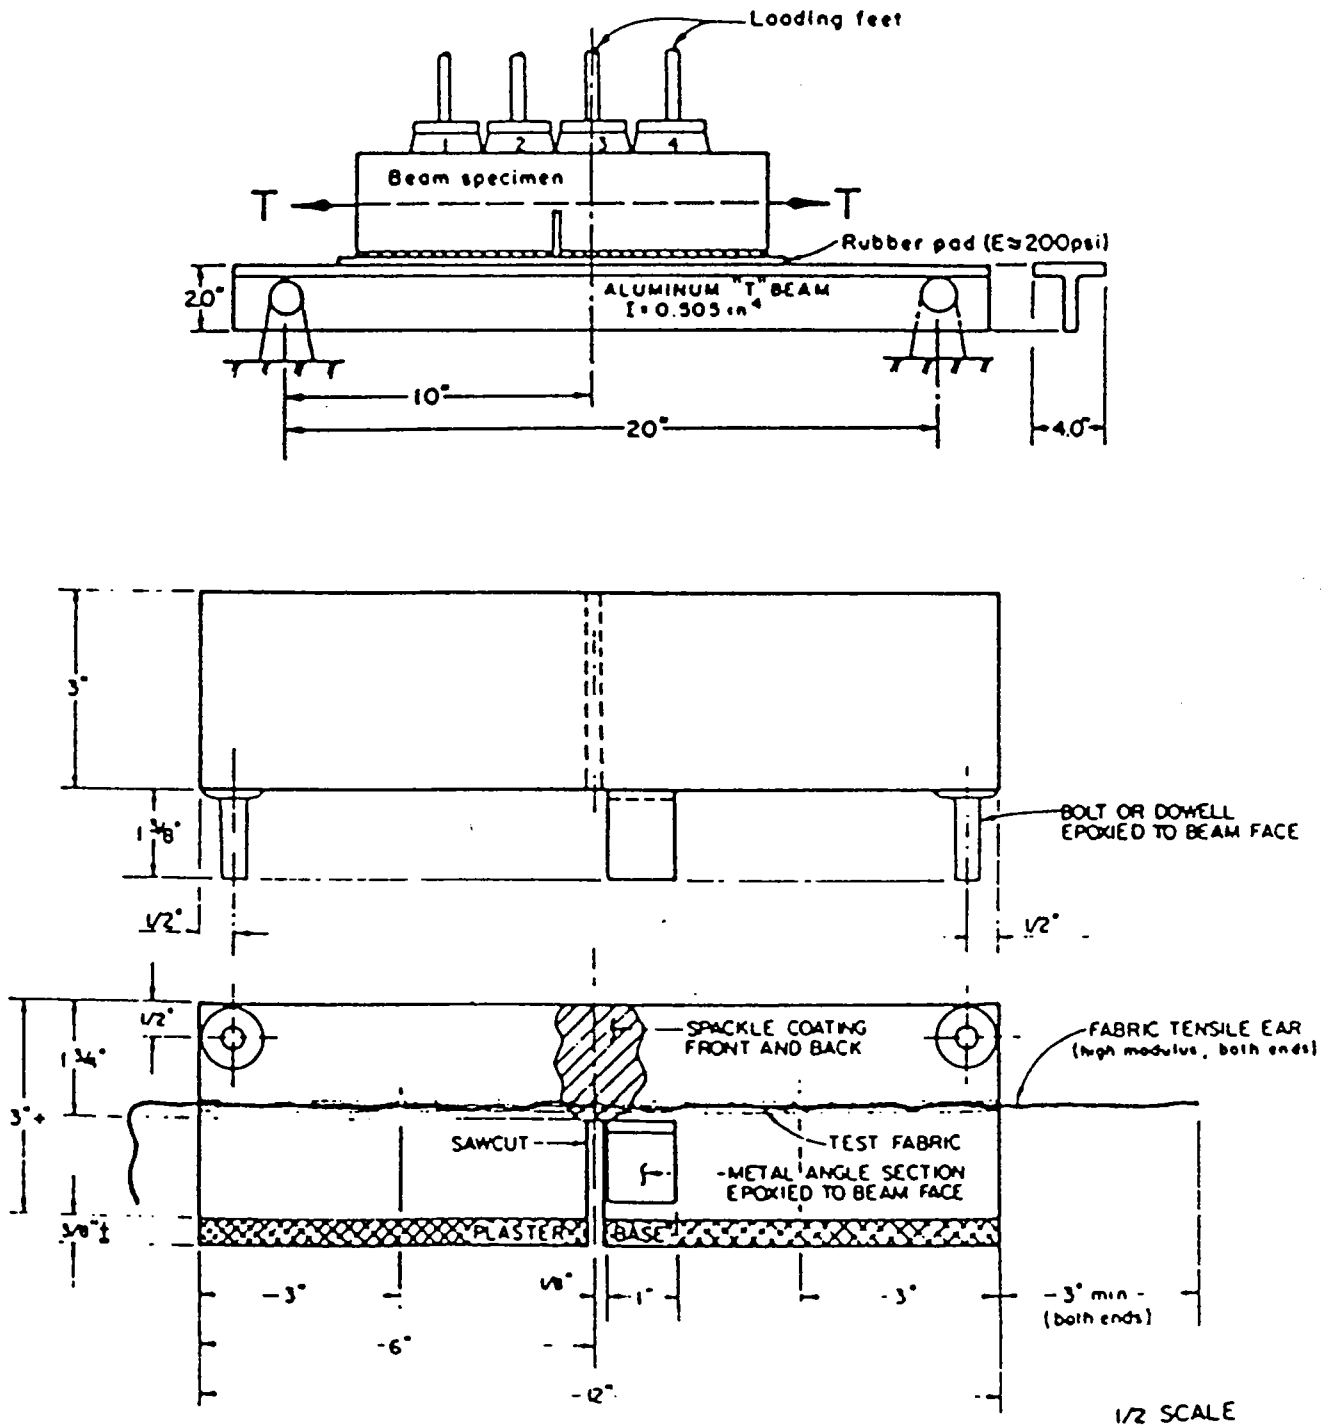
Testing Arrangement for Beam Specimens (after Smith (42))
